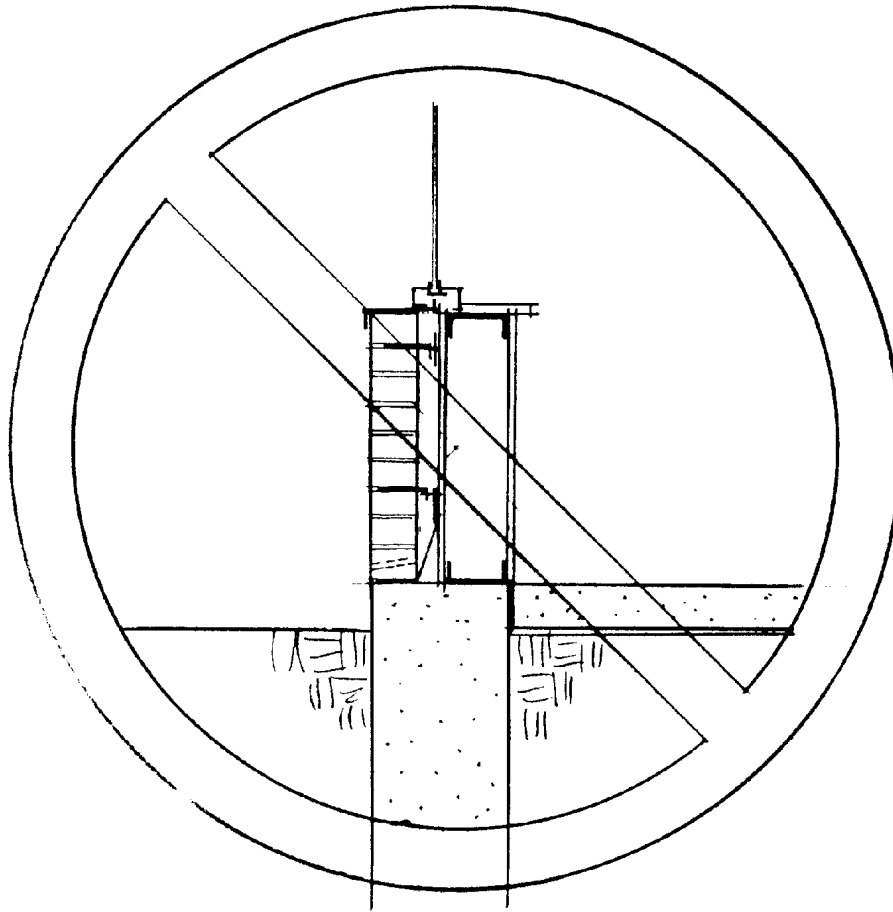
laterally unstable metal stud back-up wall. Common error at storefronts.
